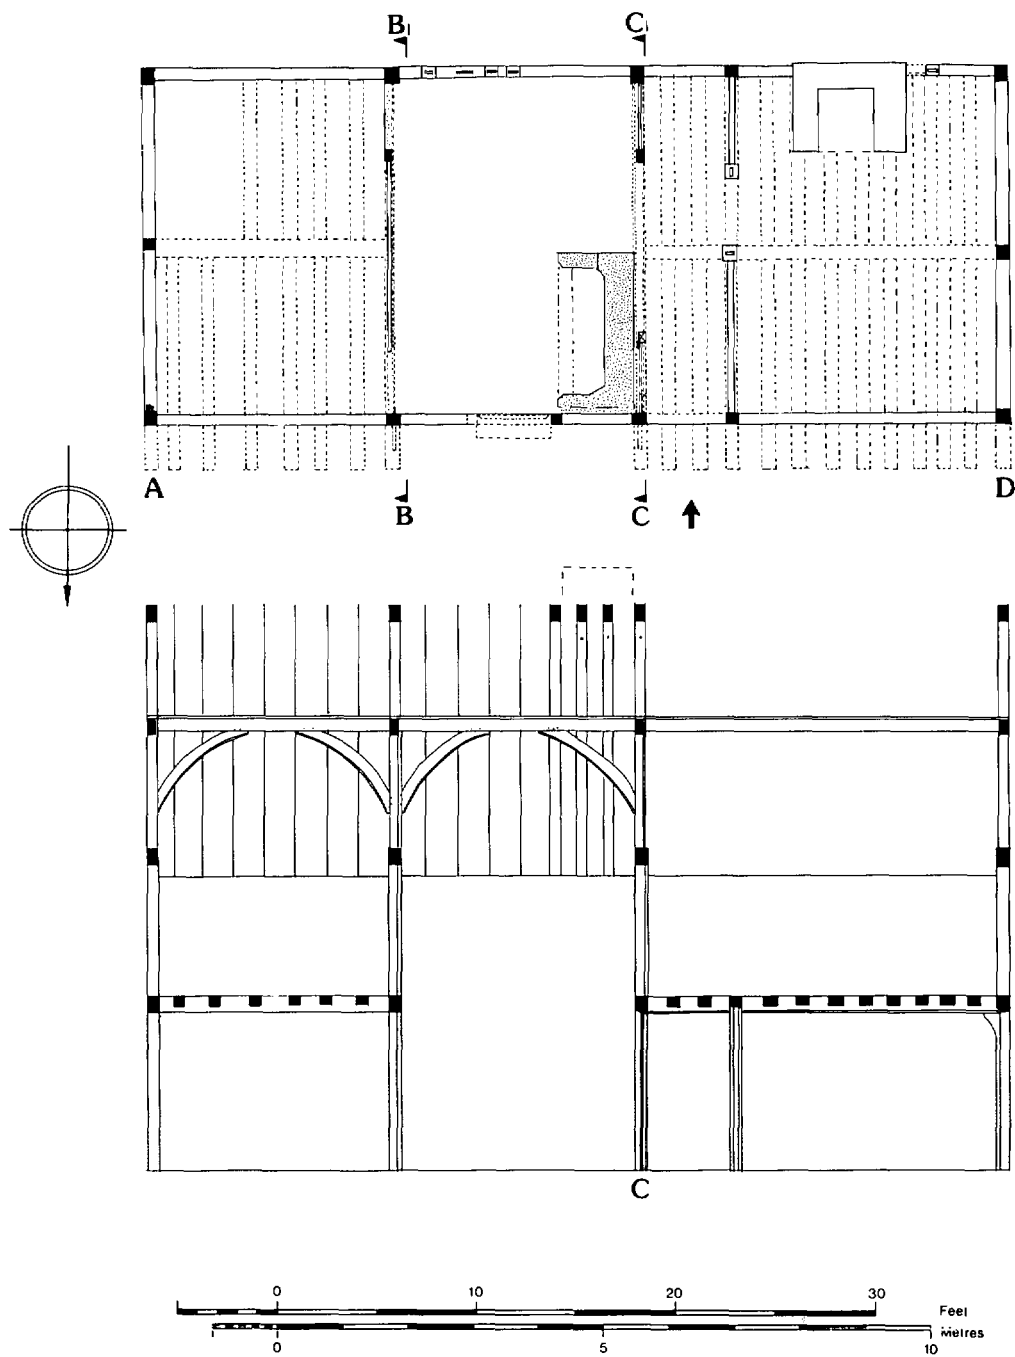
Plan and long section of 11-13 Chantry Street, Andover.
